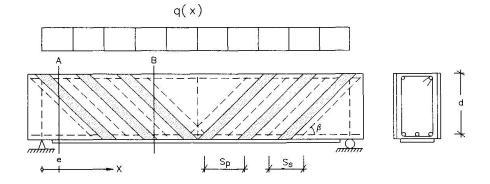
Strengthened concrete beam with a distributed load q(x)
